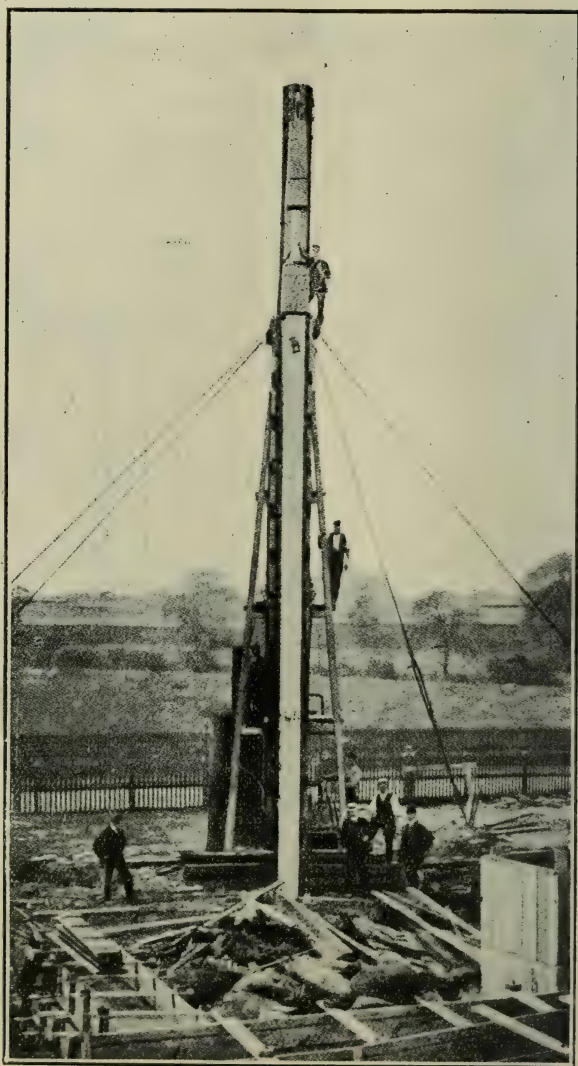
Driving reinforced concrete piles, 45 ft. long, in foundations for N.E.R. Co.
